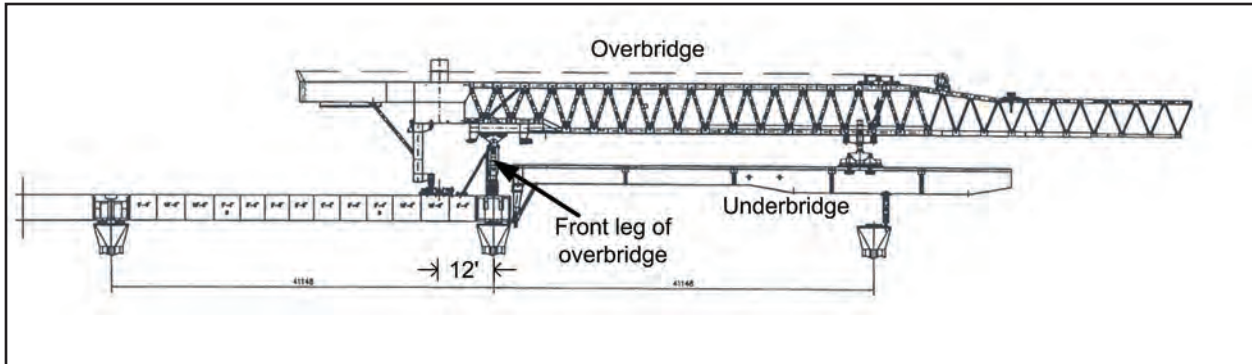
³. Overbridge moved to about 12 feet from the end of the newly completed bridge deck.
